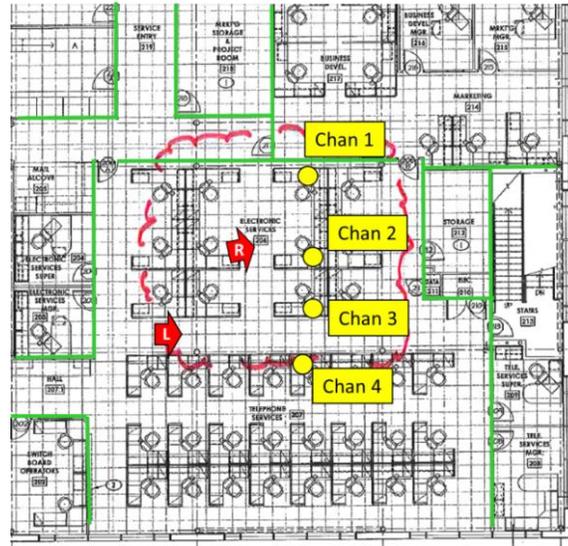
Furniture Plan, CFMS Walls, and Accelerometer Locations on the 2nd Floor
